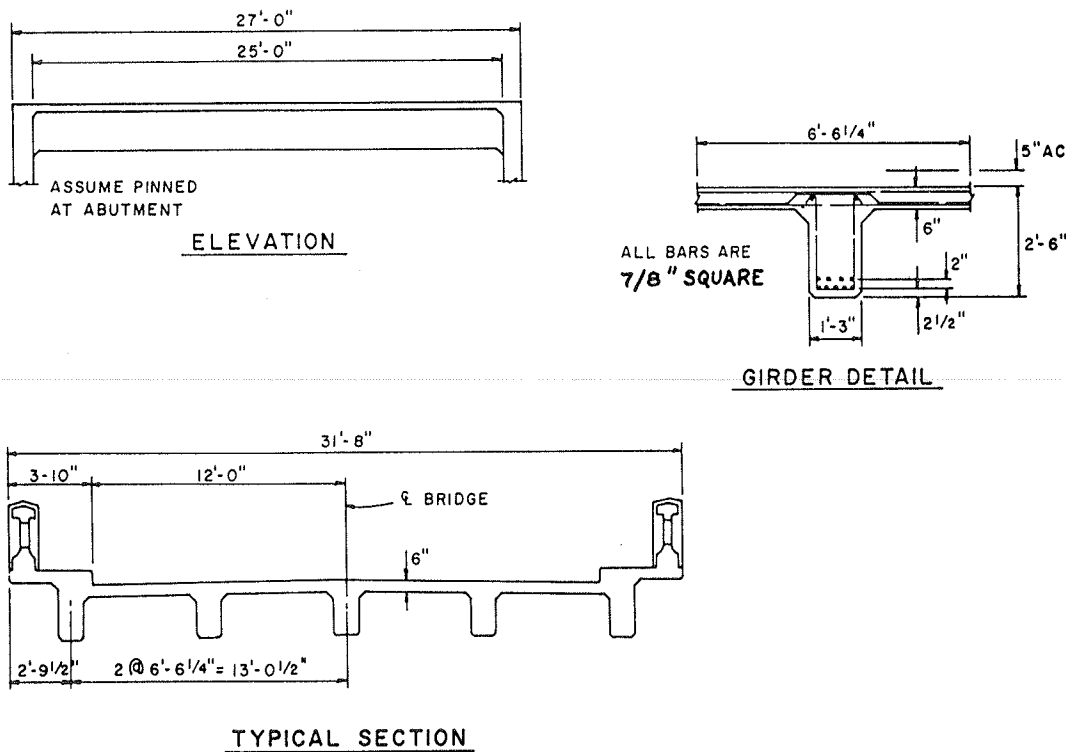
Single-span, T-beam bridge evaluated in example.
